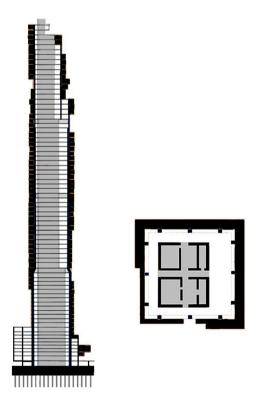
MahaNakhon: plan and section (developed by authors based on [54])
